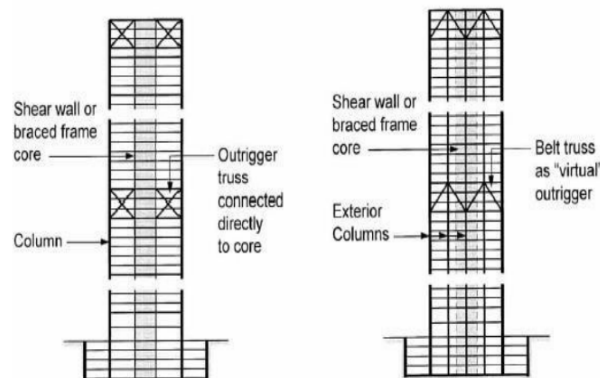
Conventional outriggers (left) and virtual outriggers (right).
